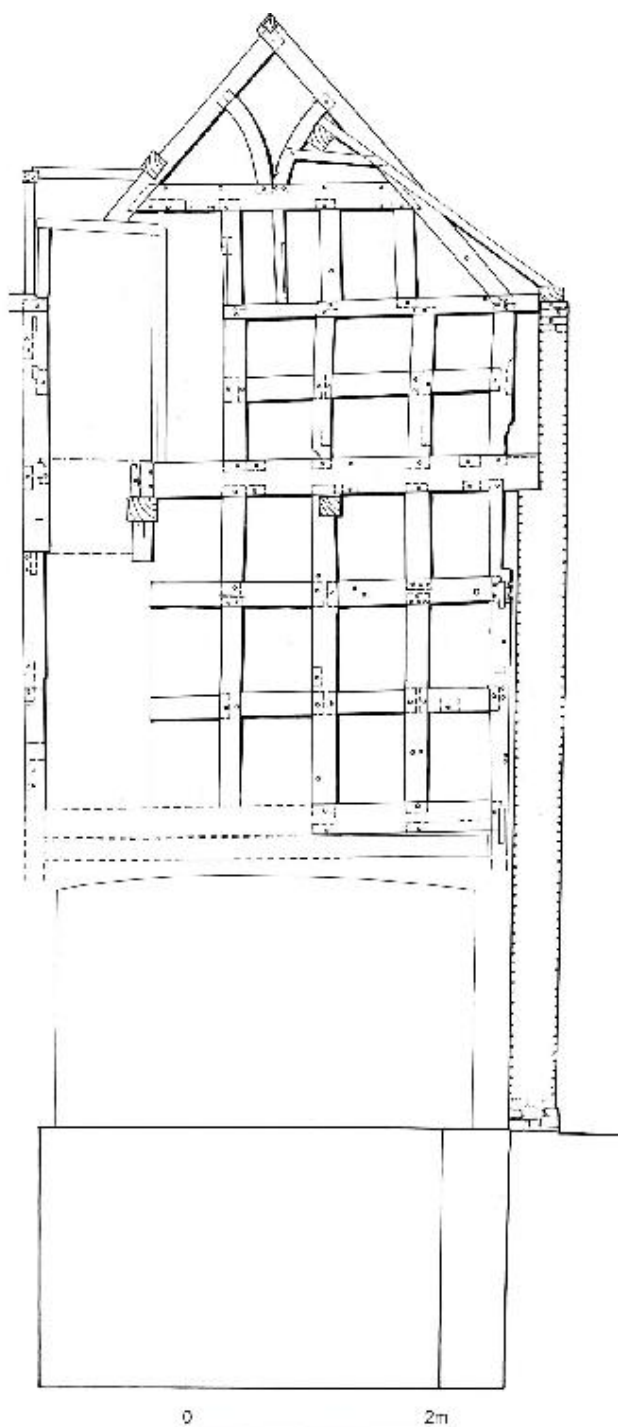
The west gable frame of the East Street (front) range of The Grapes, surveyed prior to the building's restoration and showing how the original jetty to the street had been cut back and replaced by a brick facade
